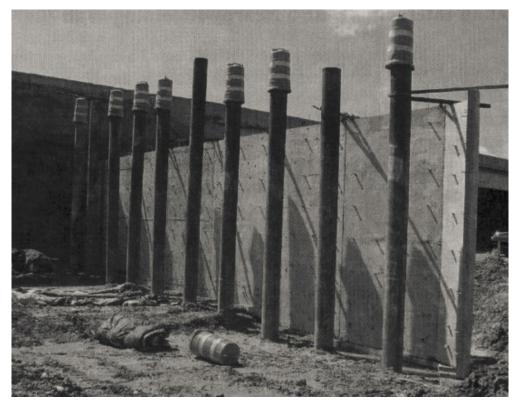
Pile foundations for a bridge overpass structure located nearby a retaining wall (Weaver and
